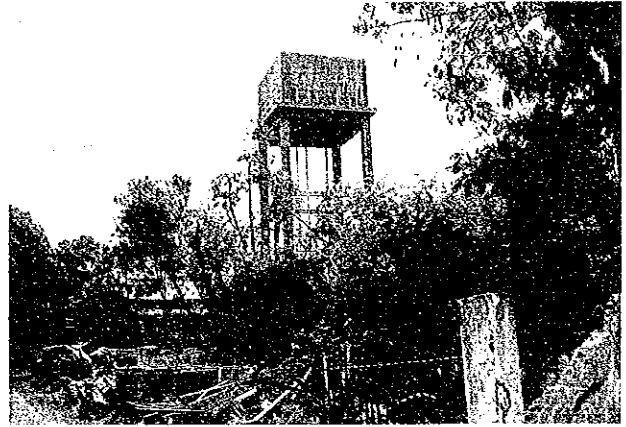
Reinforced Concrete Water Tank Structure; h=15 m; Slight Damage
